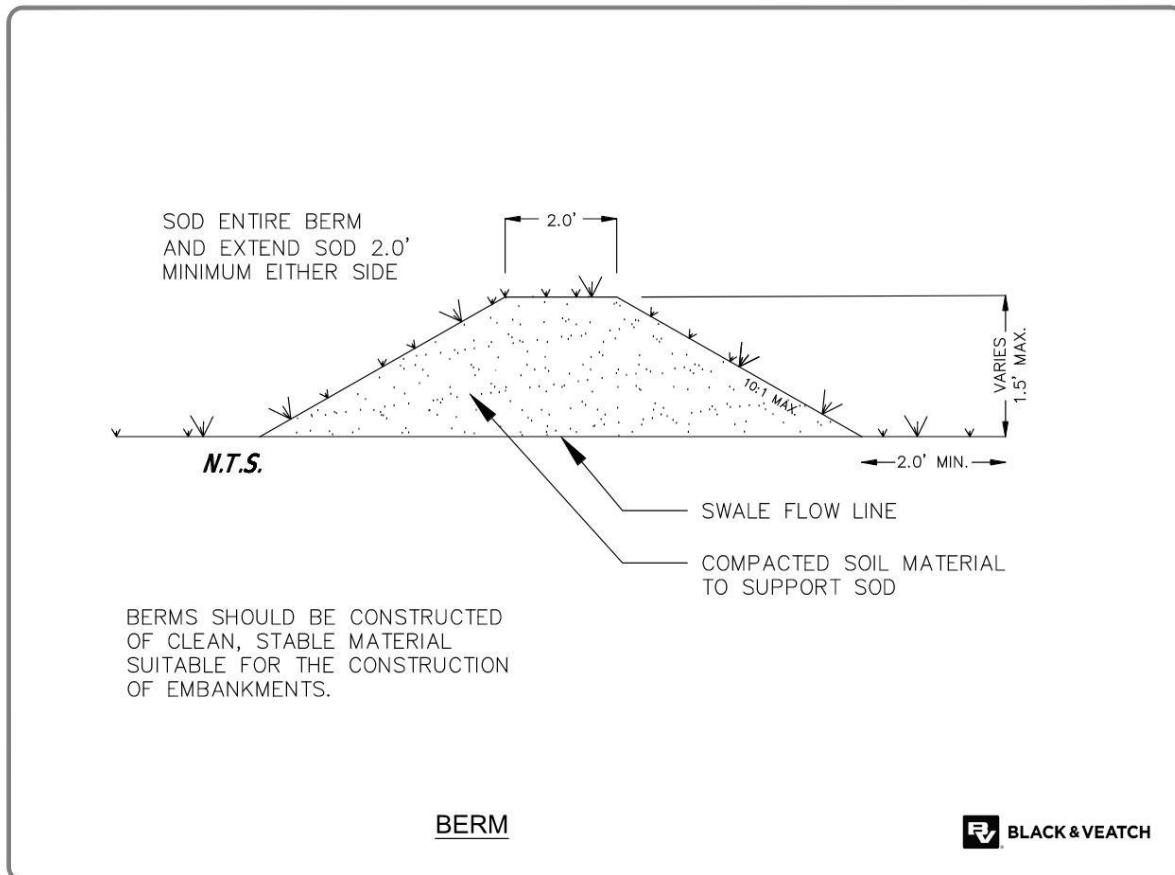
Standard Detail Depicting a Typical Stormwater Berm Design.
